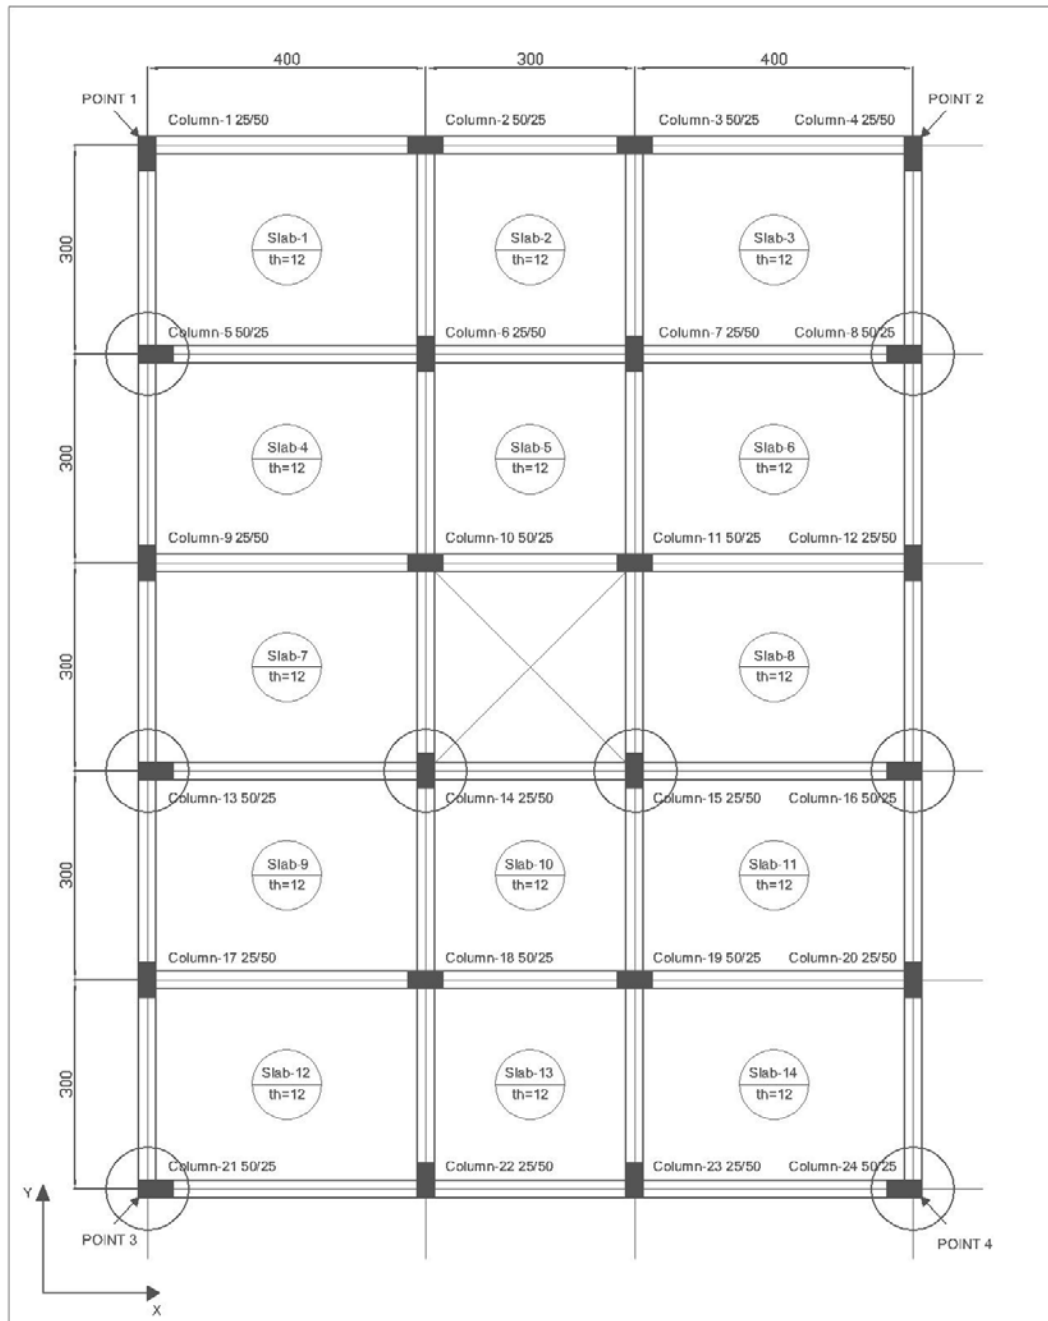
Structural Plan of Idealized Parametric Model-B
